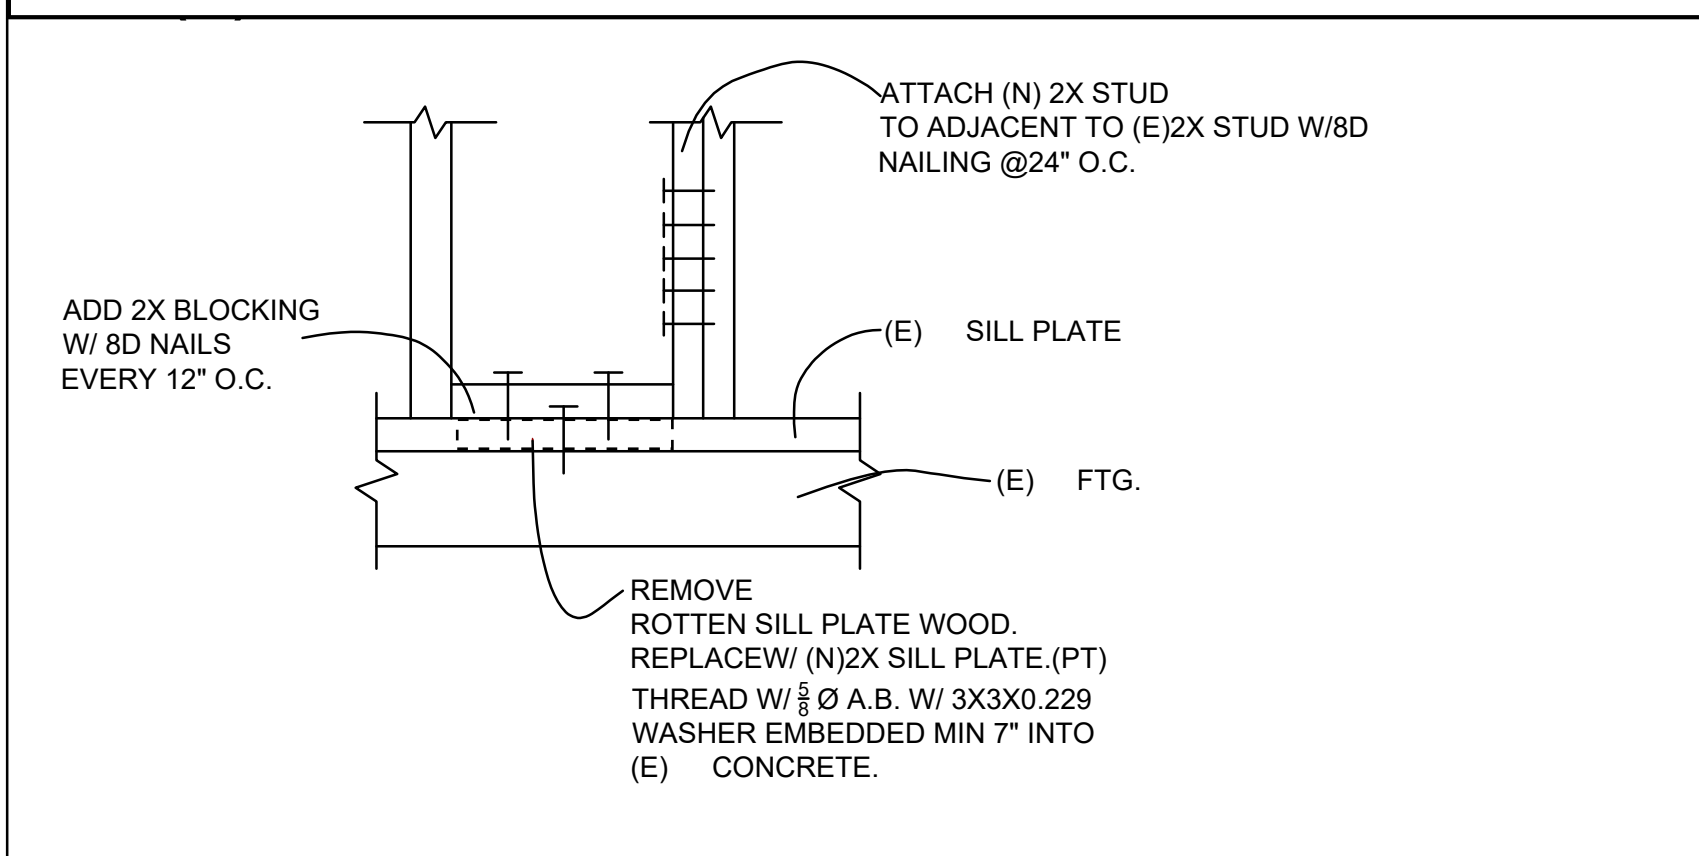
FOUNDATION RETROFIT DETAILS
